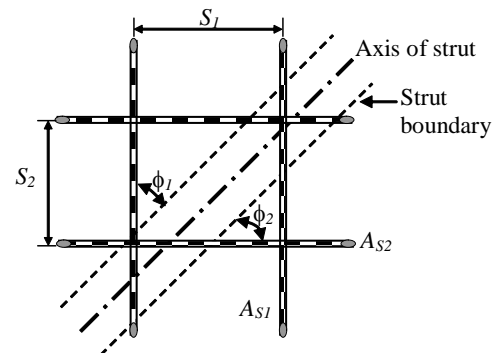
Crack control reinforcement crossing a bottle shaped strut
